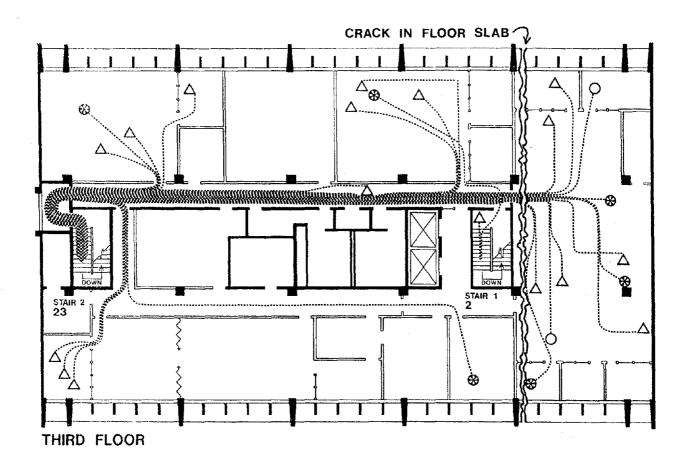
Floor slab crack in relation to escape stairs.
